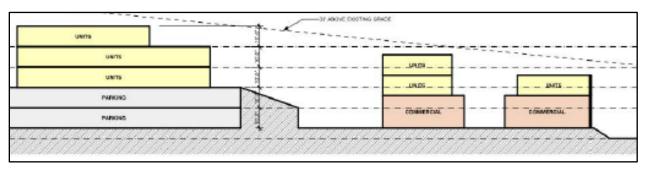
Concept Plan 3 (source: SDA 2019)
